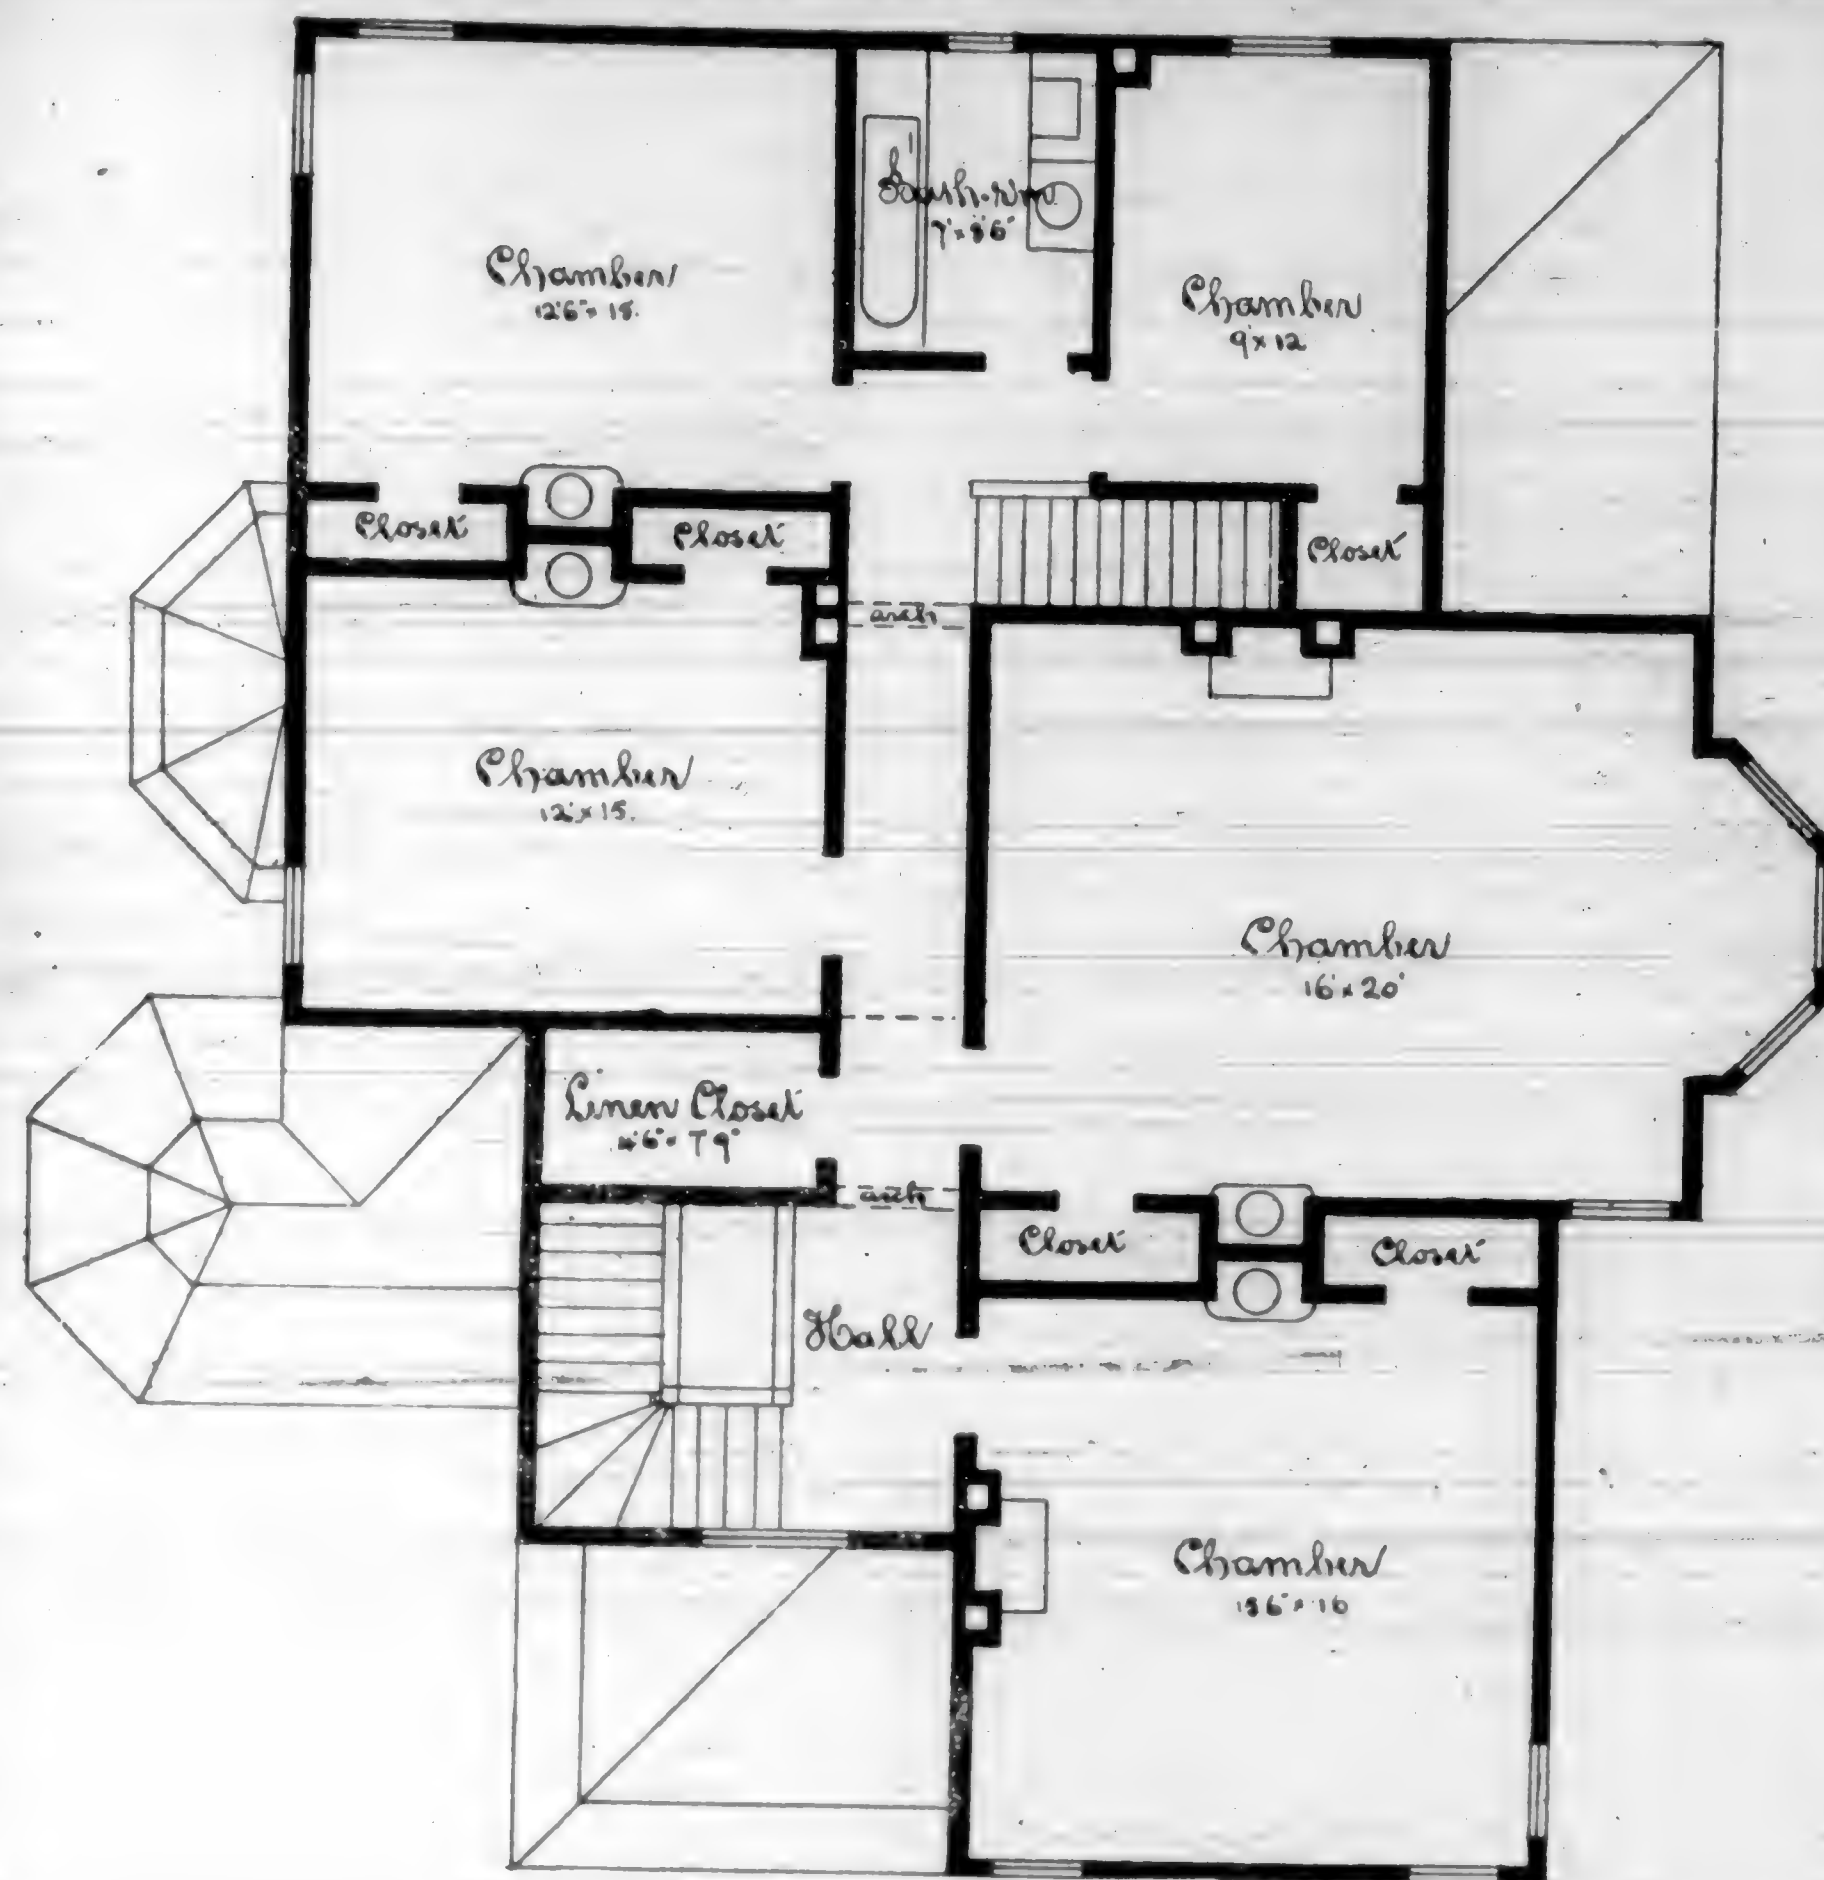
SECOND FLOOR PLAN OF SUBURBAN DWELLING.
